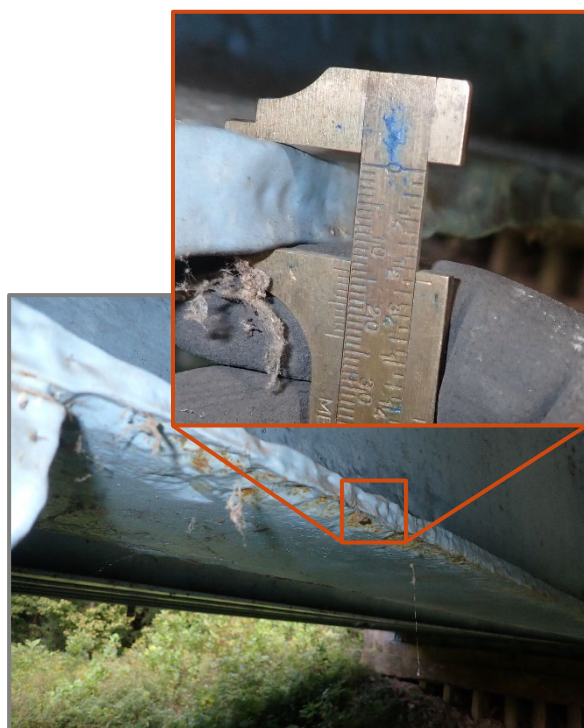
Bottom flange of Beam 7 in Span 3 adjacent to Pier 2 with 1/2" remaining for 2" width on both edges, looking northeast.
